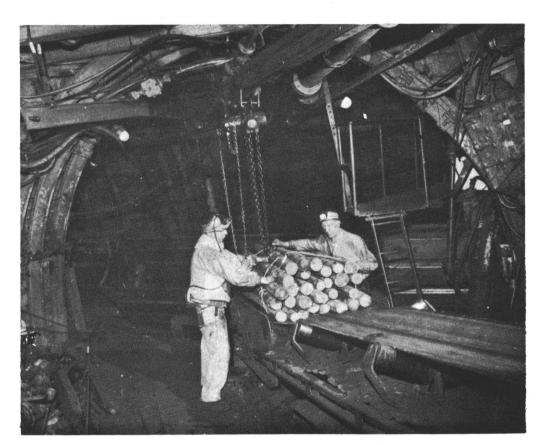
Tub in tilted position. A bundle of wooden props has been placed on the conveyor; the cord is being cut.
